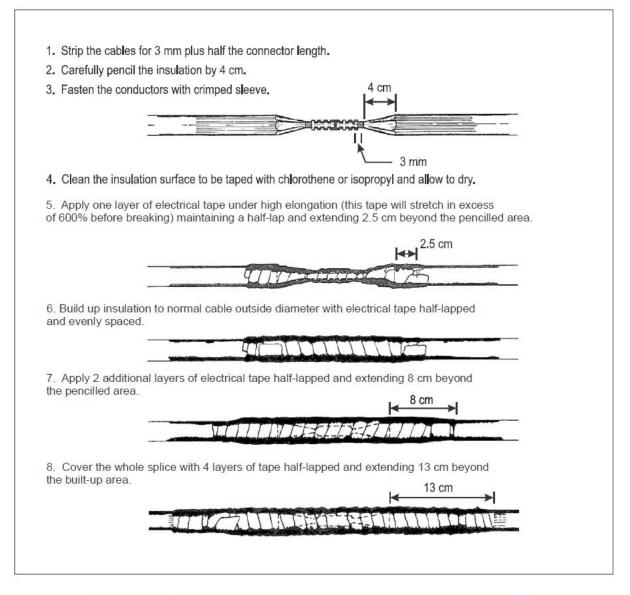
Taped splice — typical (refer to the manufacturers' instructions)
